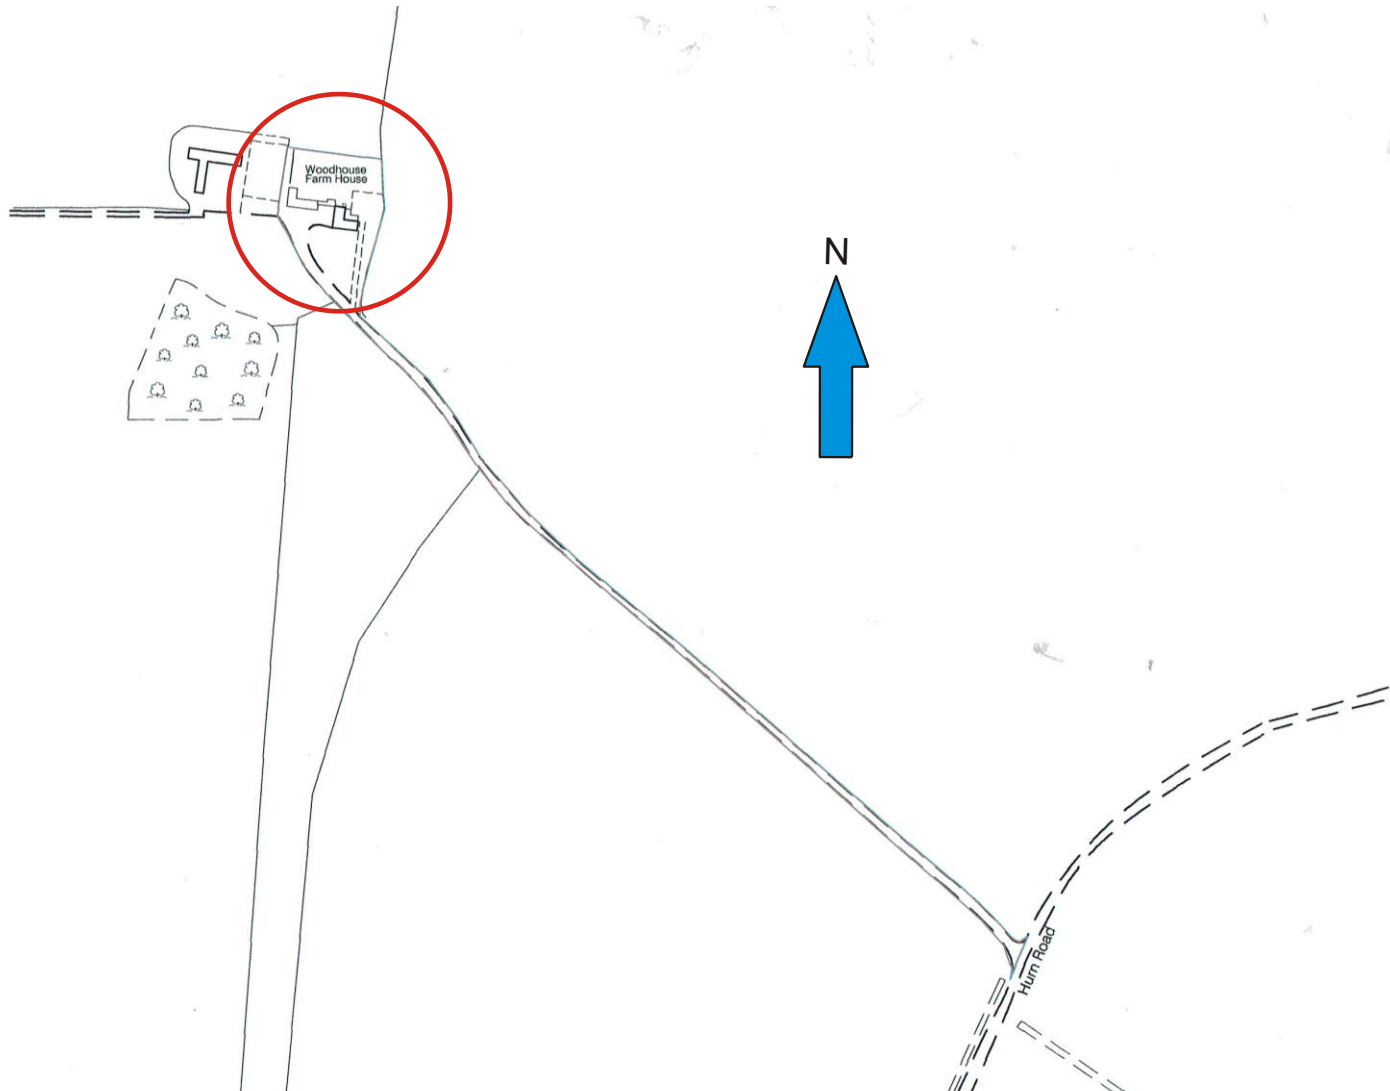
Site location at an original scale of 1:2,500 at A3, (not to scale), (extract from Architects plan)
